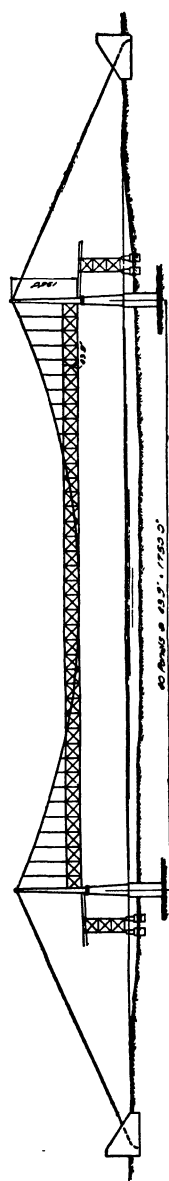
Layout of Wire-Cable Suspension-Bridge.
